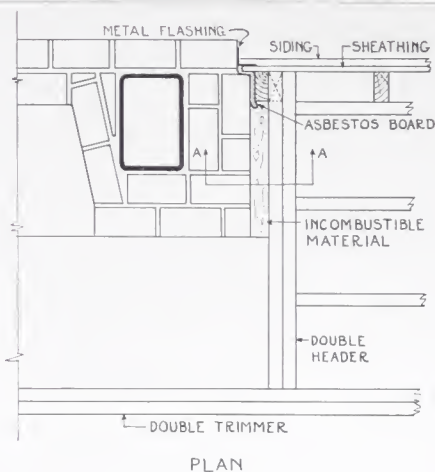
FLOOR FRAMING AROUND A SINGLE FIREPLACE, NOTE FILLING BETWEEN FRAMING AND BRICKWORK, WHICH SERVES BOTH AS INSULATOR AND FIRE-STOP.
